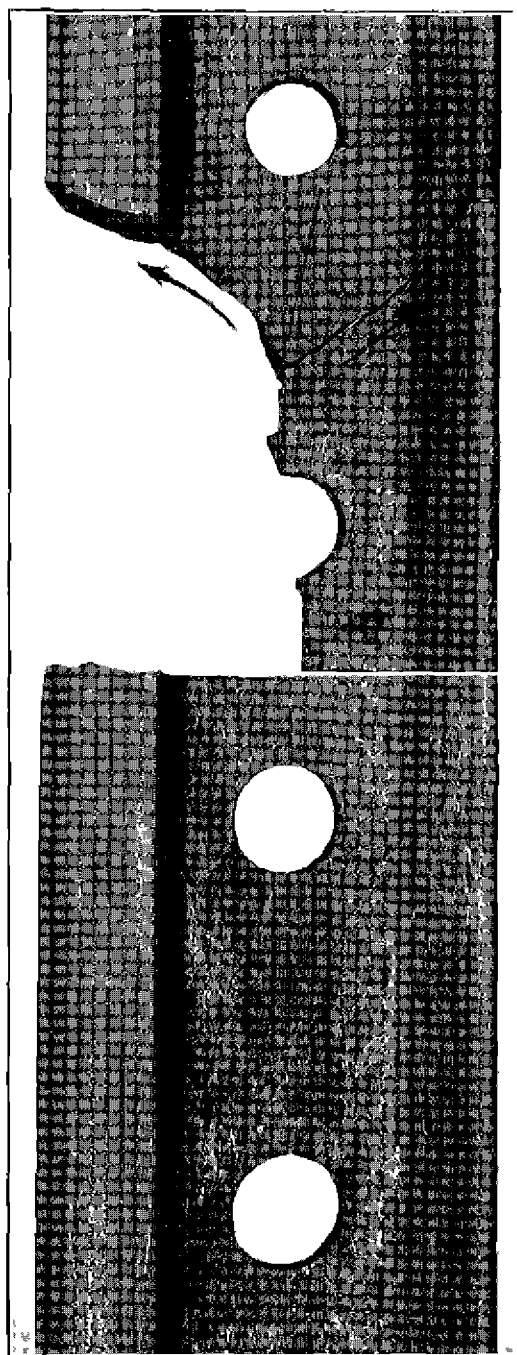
Leaving, end of Columbia 1905 rail showing preexisting bolt hole fracture with crack extending to second bolt hole. New fracture bifurcated separating head web and base. Missing fragment of head 6 inches long. Cut also shows receiving end of P. S. Co. 1897 rail.
